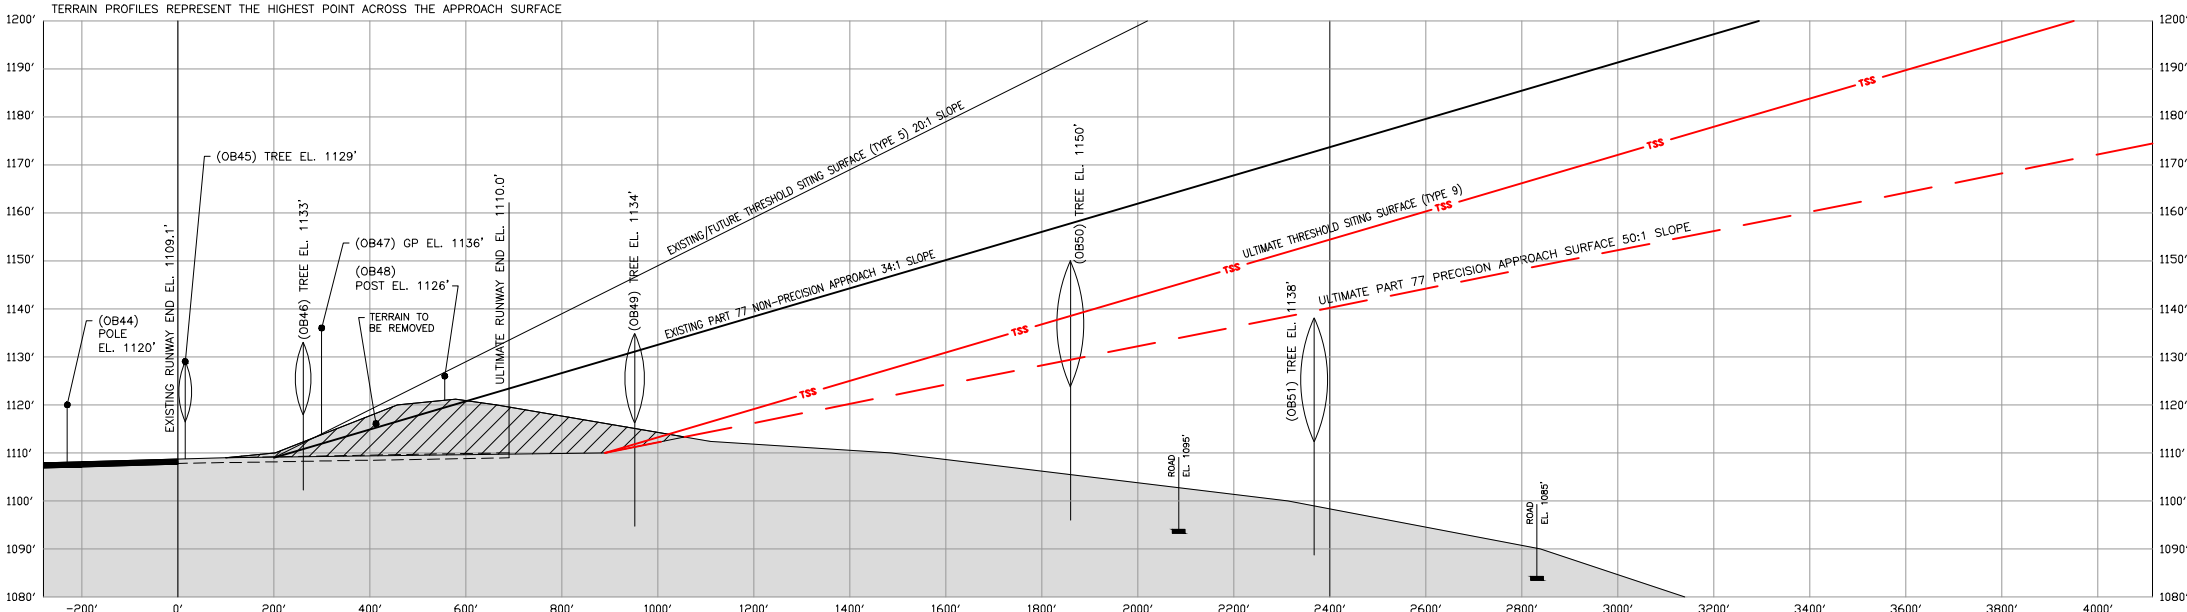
Inner Portion of the Approach Plan & Profile - Runway 4
